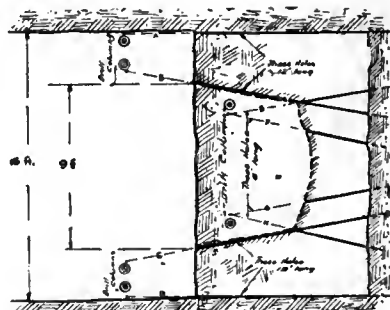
PLAN OF DRILL HOLES IN SUBMARINE SLOPE
